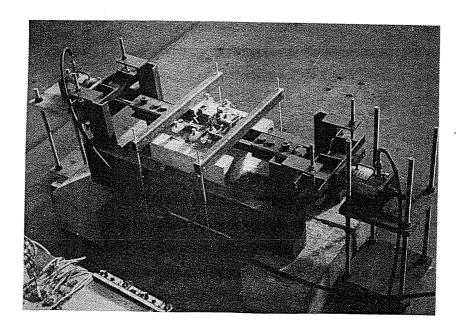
Test frame for single-anchor steel-to-concrete connections
